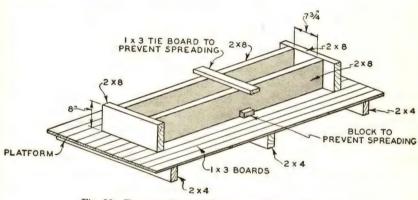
Form for Pouring Reinforced Concrete Lintel
